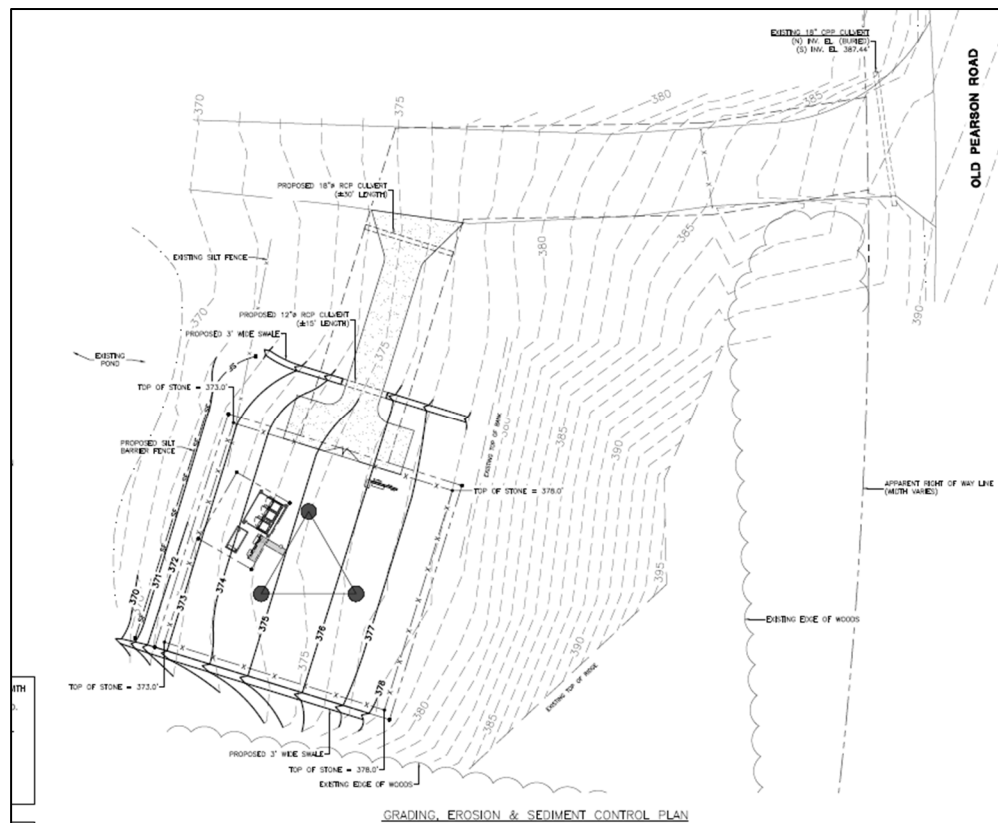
Site Plan with Stormwater and Sediment Controls
